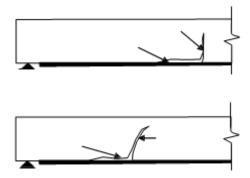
Crack propagation parallel to bonded plate (Garden and Hollaway, 1998; Smith and Teng, 2002; Ashour et al, 2004; Esfahani et al, 2007).
